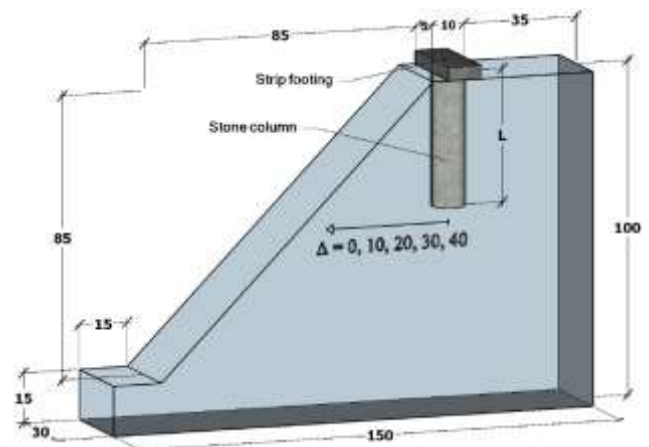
Dimensions of the clay slope and location of footing and stone column (unit: cm).
